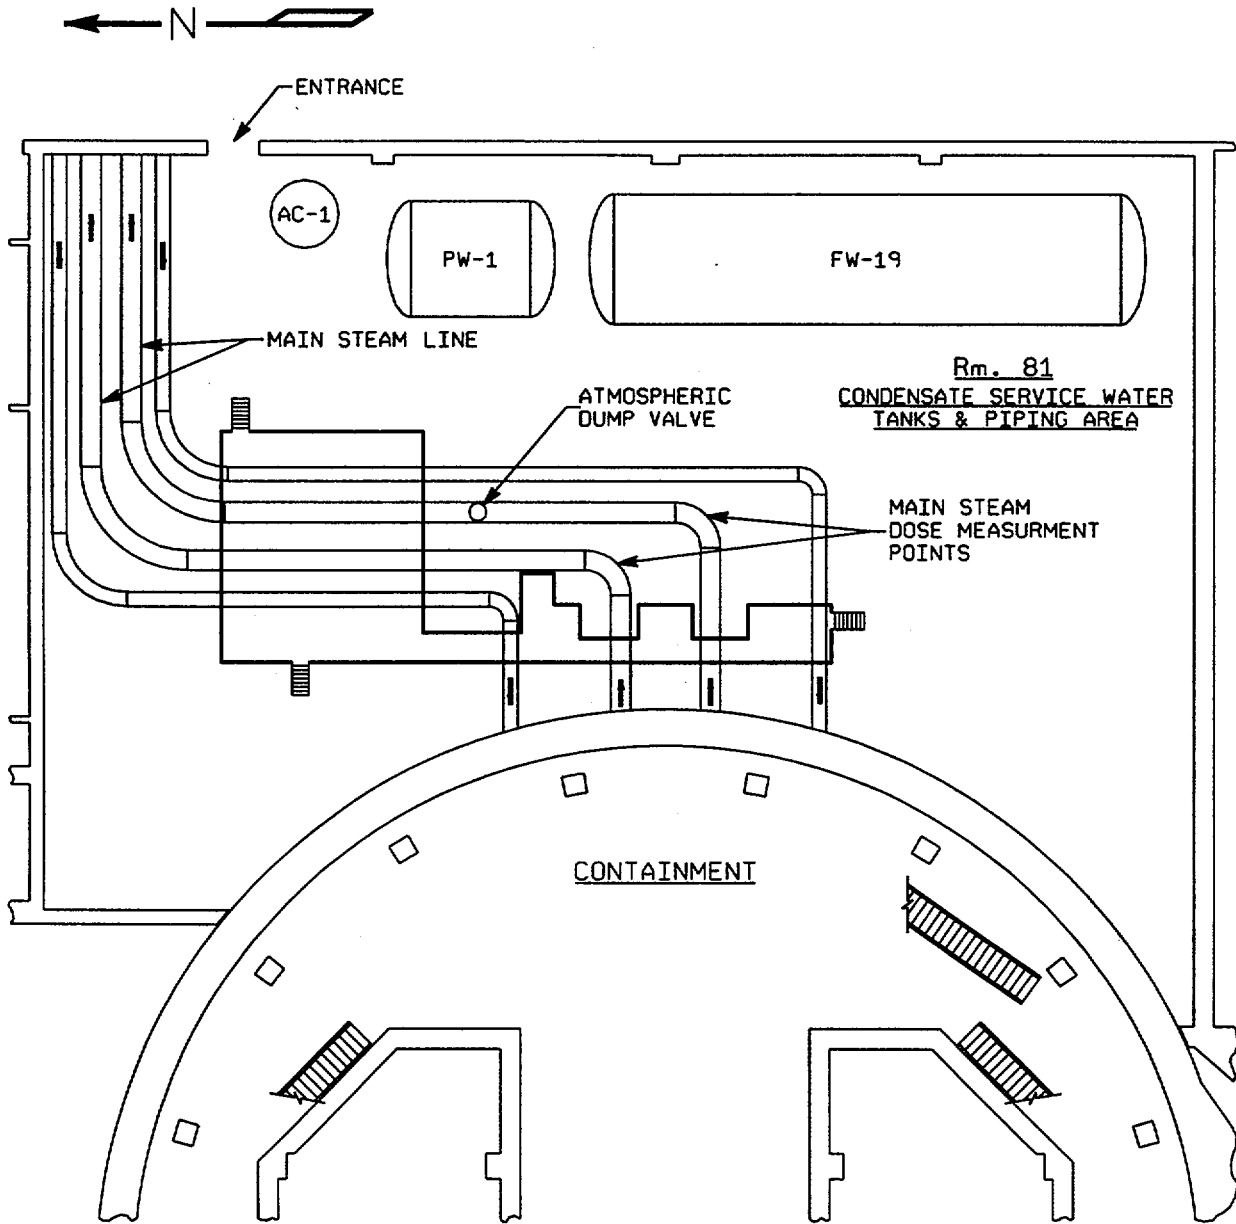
Auxiliary Building - Plant Elevation 1007'-0" & 1013'-0"
